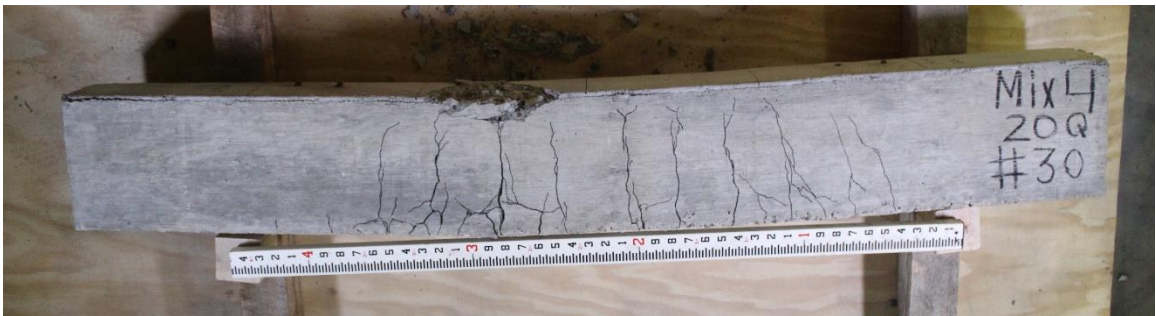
Mixture 4 (20Q) beam #30: concrete beam side view.
